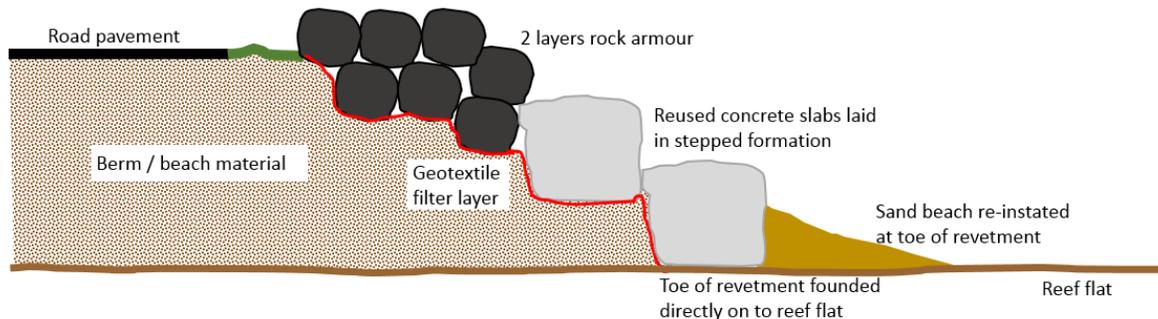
Cross-section of the proposed reconstructed revetment at Paal
